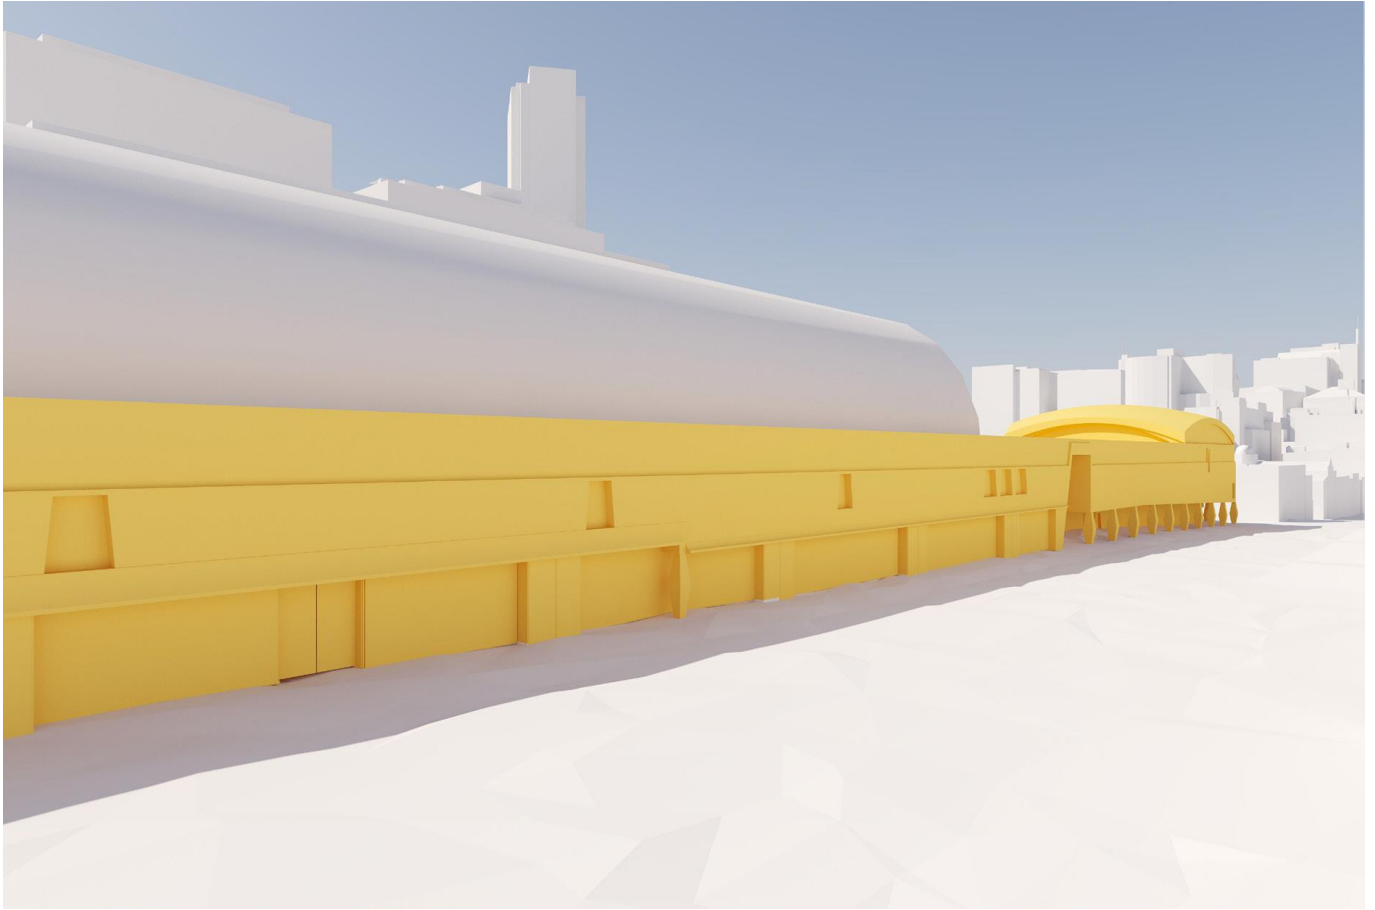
Viewpoint 7: 537 Harris Street – proposed view
